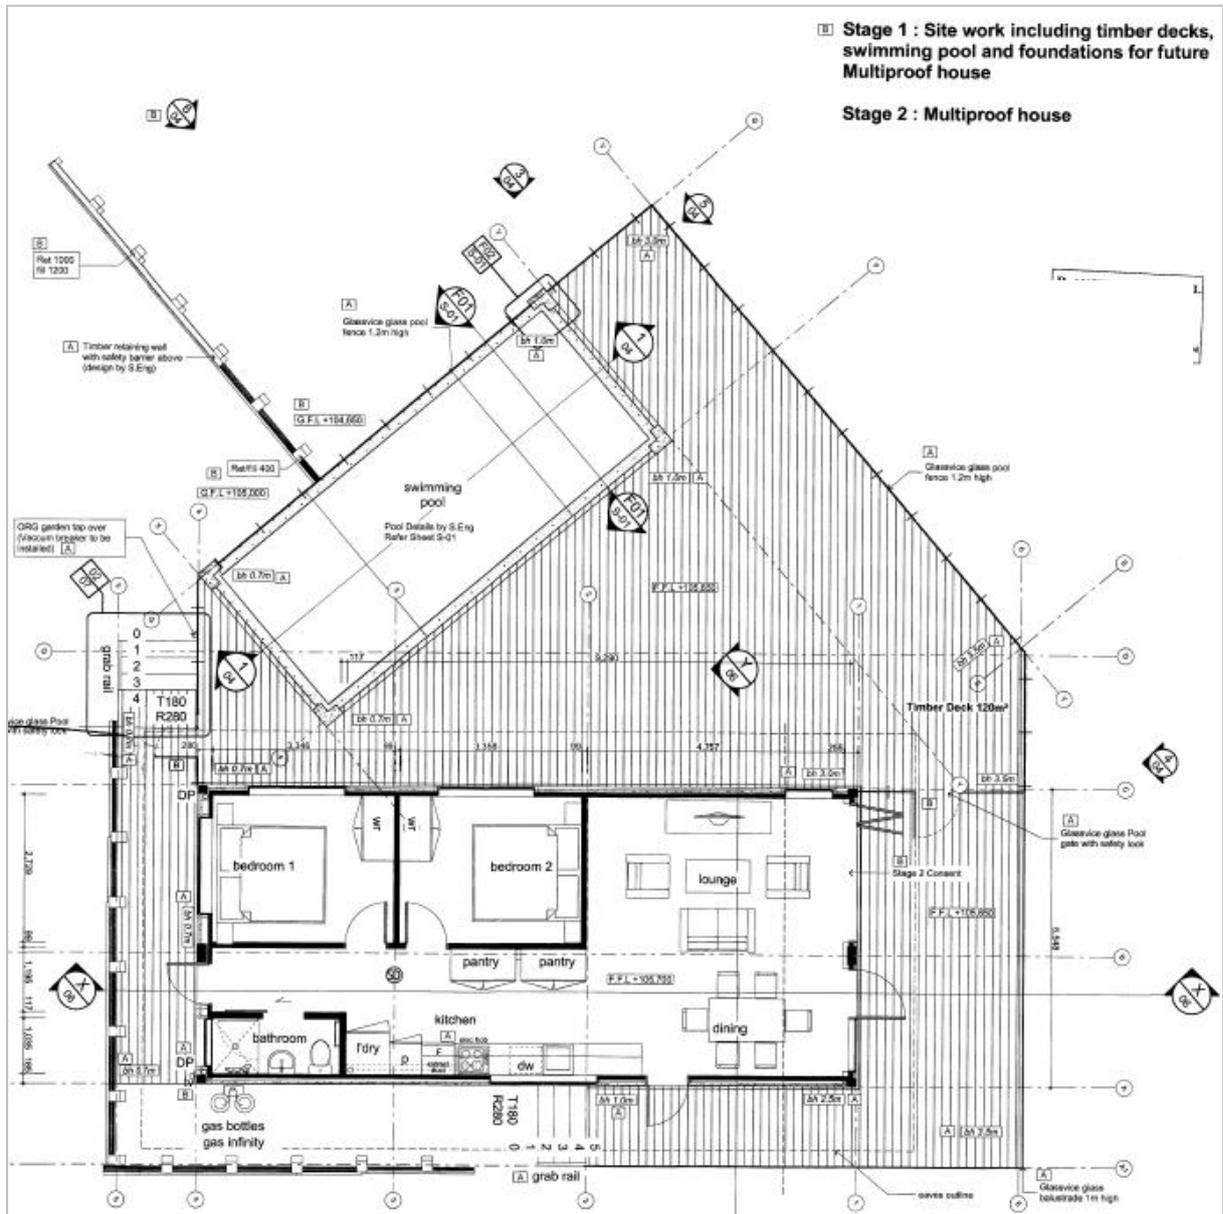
Detail of proposed dwelling layout submitted for stage 2 building consent (not to scale)
